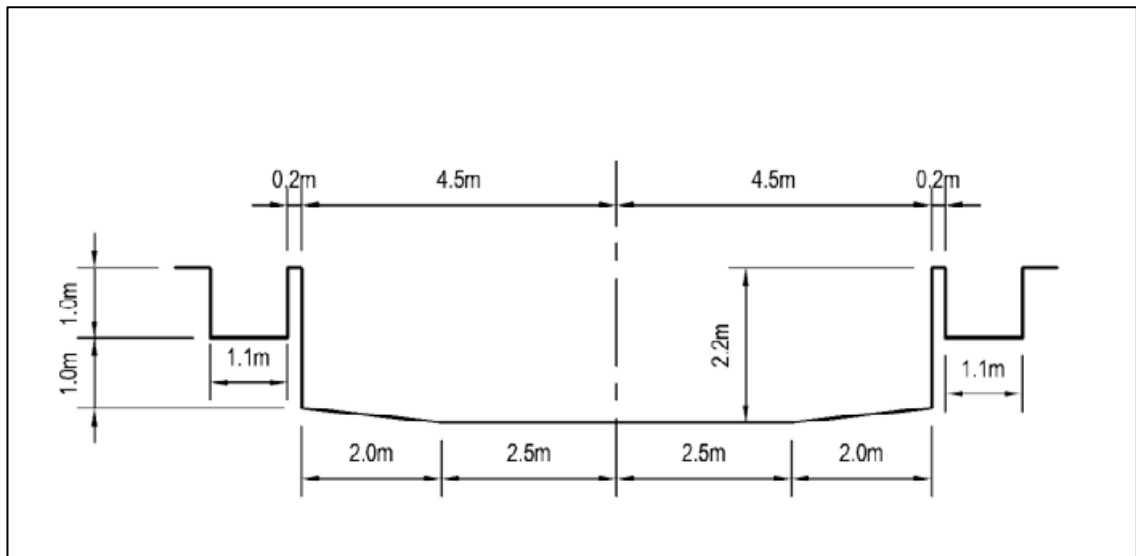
Indicative OSD Channel Section for Onsite Detention (Concept Plan 12/08/2011)
